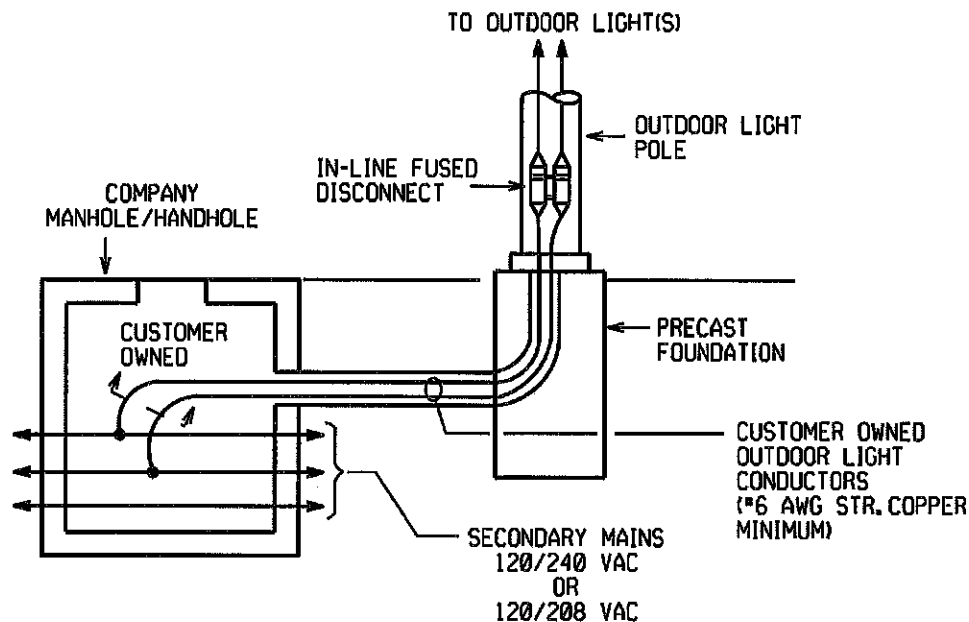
Connection of Underground Supplied Customer Owned Outdoor Light to National Grid Handhole or Manhole – Non-Standard Connection
